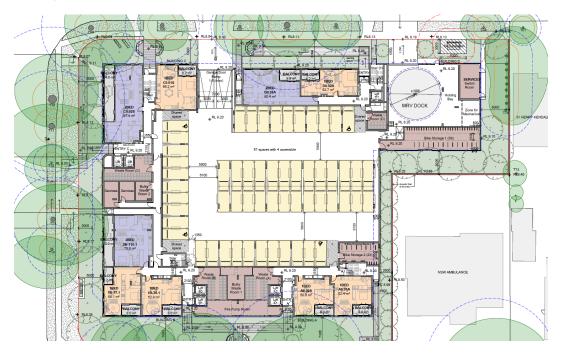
Plan showing waste rooms and services to Coward Street and Botany road
